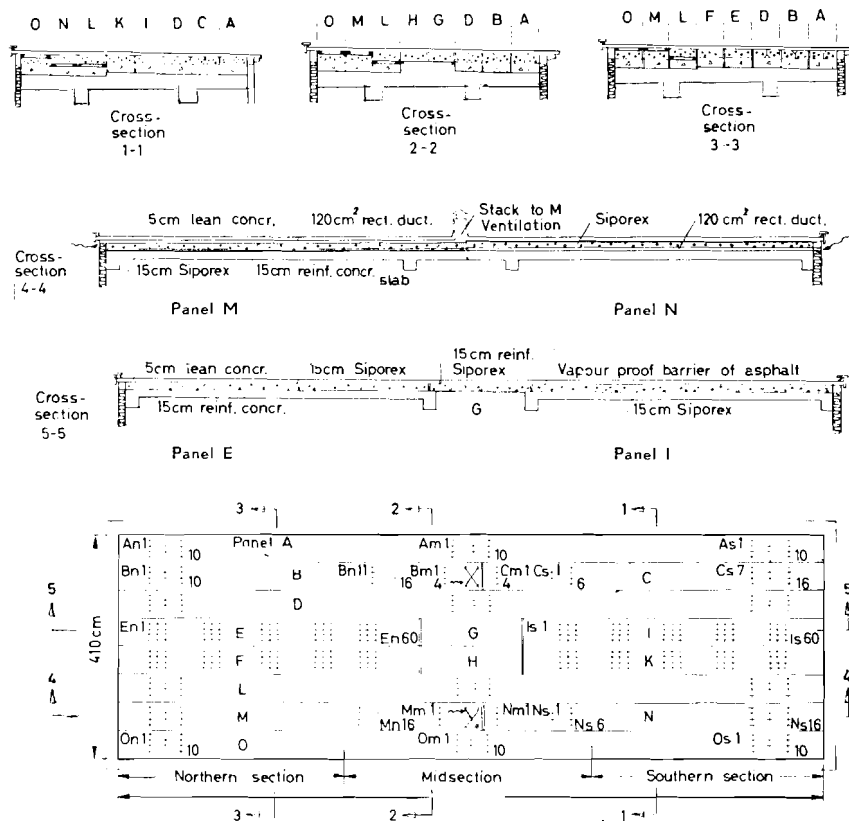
Large Roof Laboratories, N.T.U., Trondheim.
